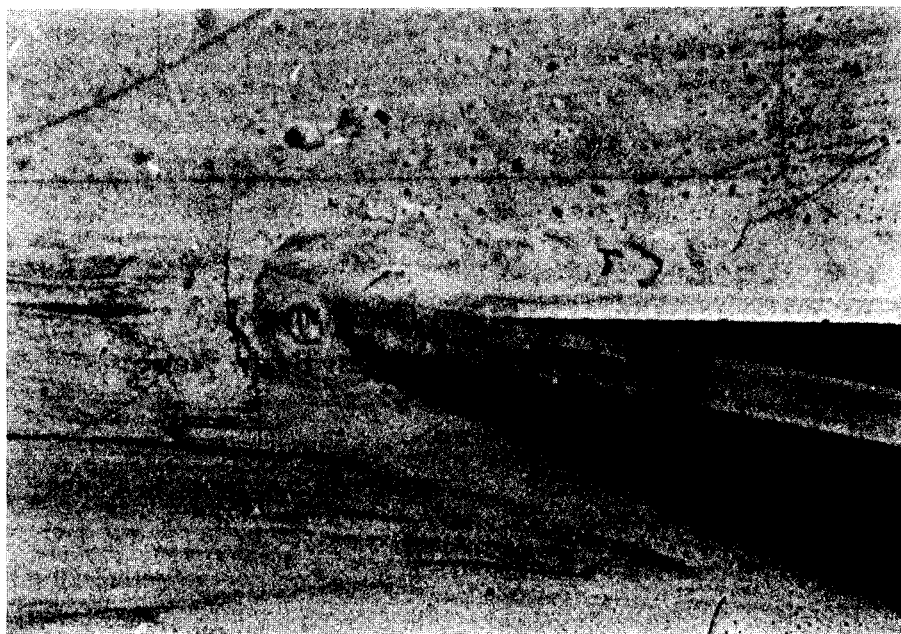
FATIGUE CRACK AT TOE OF ATTACHMENT FILLET WELD
